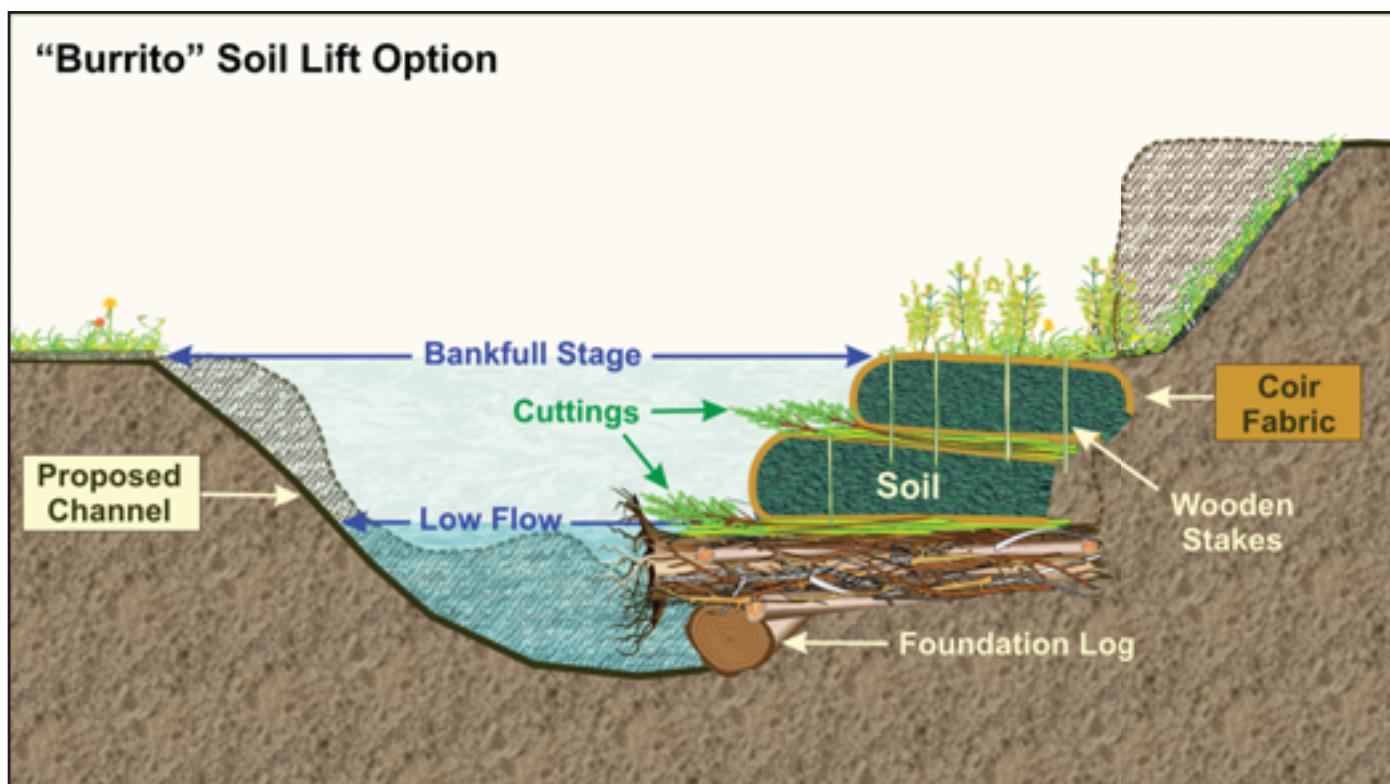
The toe wood structure with cuttings and "burrito" soil lifts.
